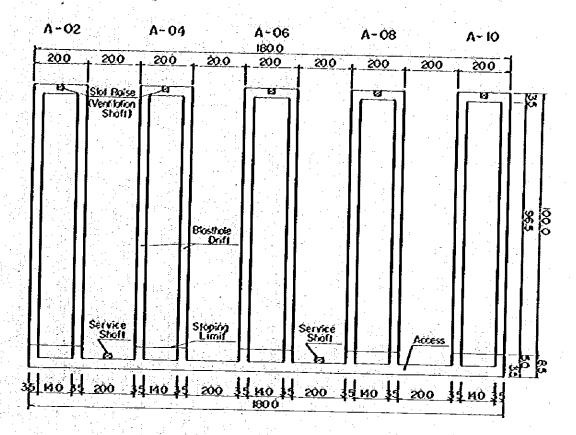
Plan of Sublevel for Block-A (Unit: m)
